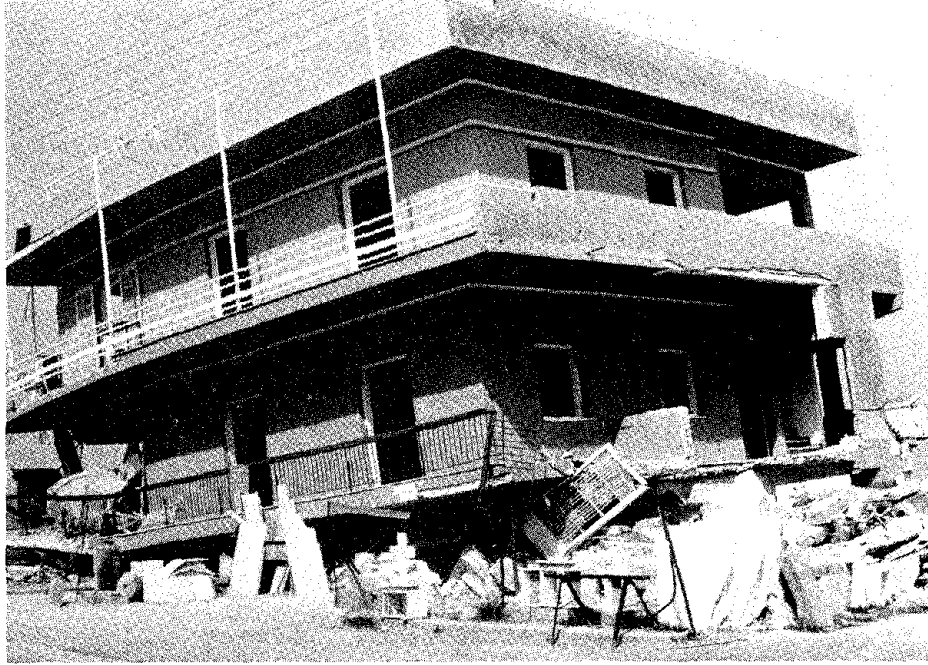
Collapse of three-story house in Kiato. (Lower floor was stone mason's shop.)
